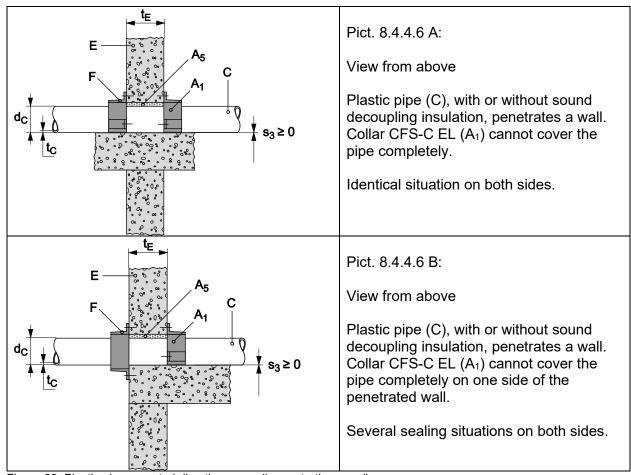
Plastic pipe mounted directly on a wall, penetrating a wall
